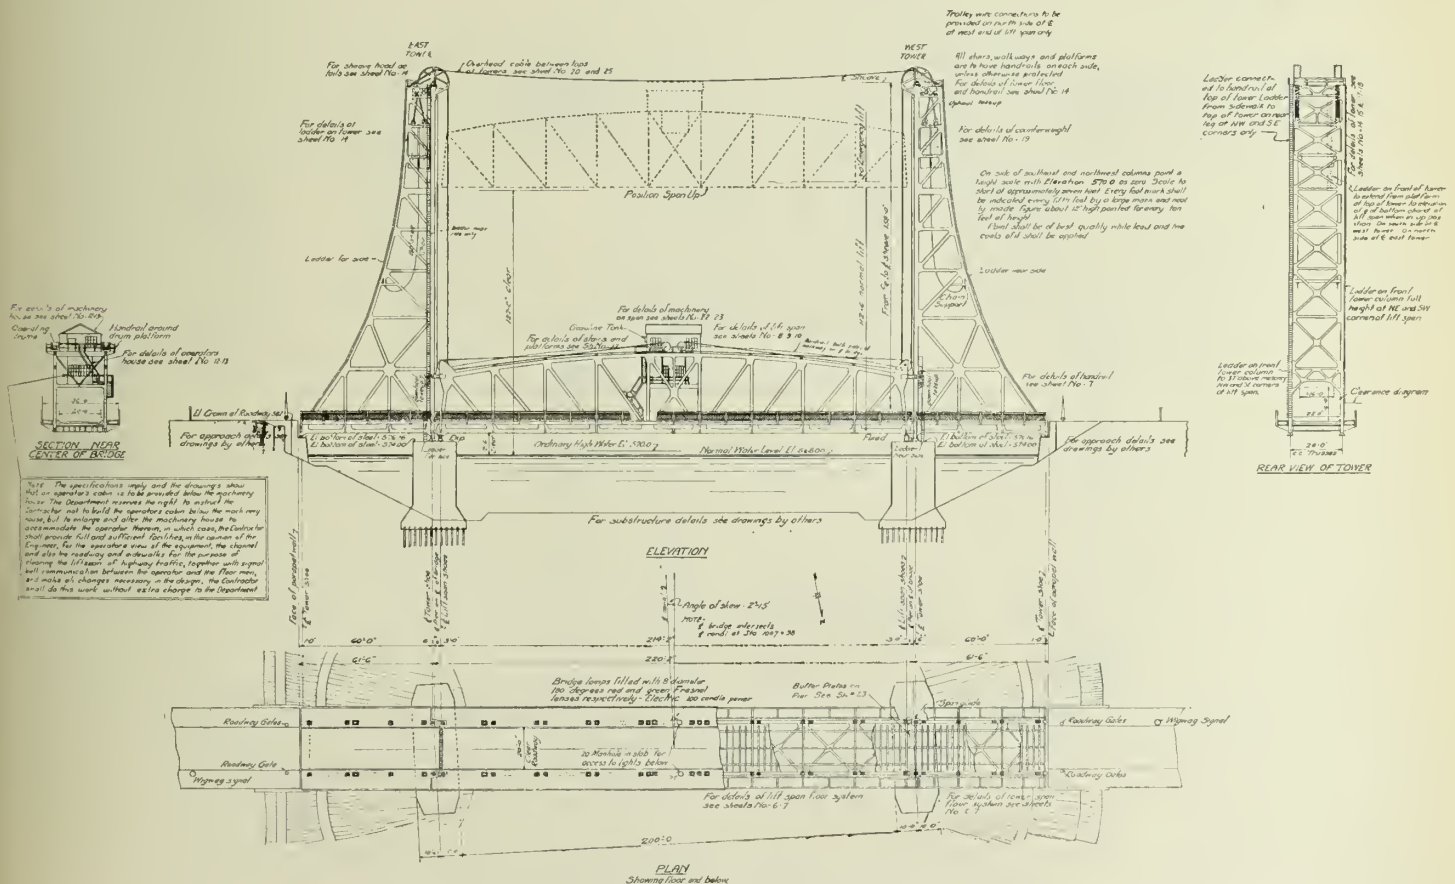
Bridge No. 14—General Plan and Elevation.
